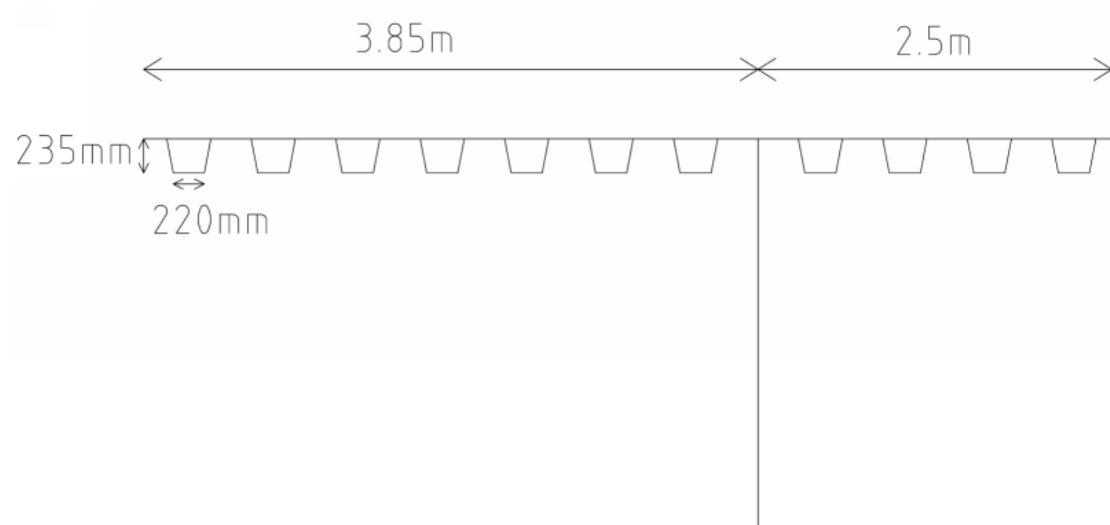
Cross section of the main girder used in deflection calculations by hand
